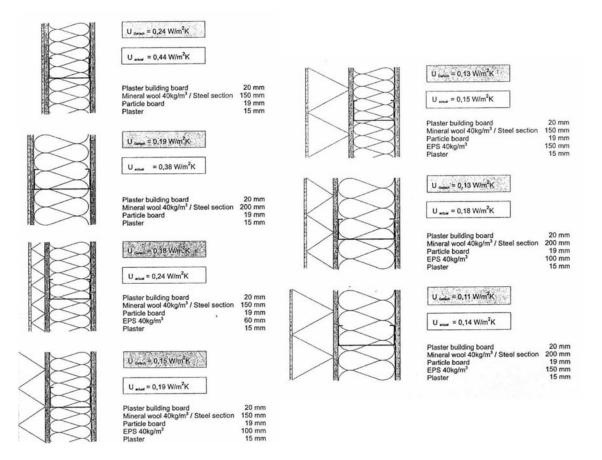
Effect of thermal bridges in the steel wall constructions (samples from Swedish literature)
